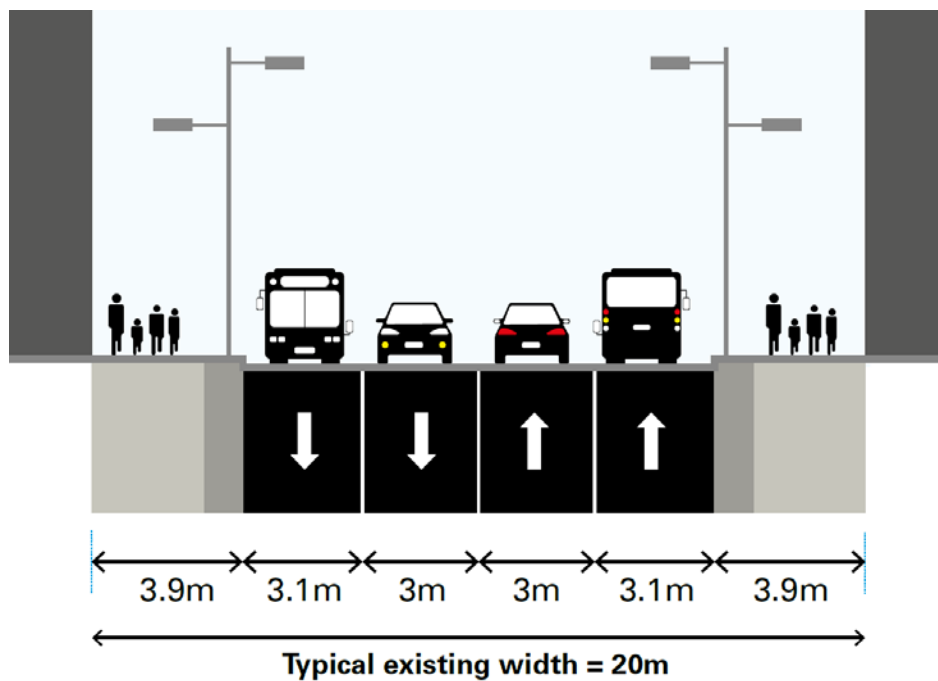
Typical Cross Section from Queen Street to Gerrard Street
